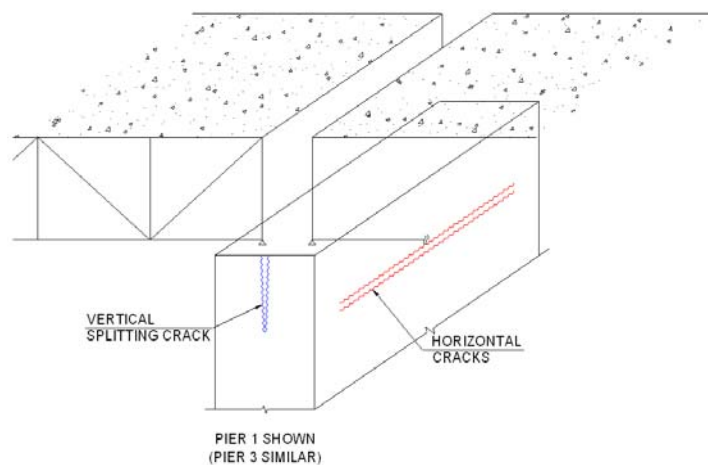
Typical Cracking Patterns Observed in Piers 1 and 3
